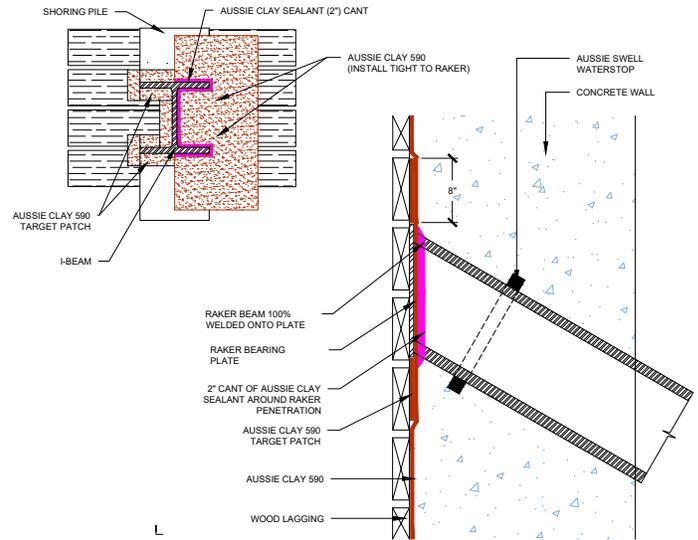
WALL I-BEAM RAKER DETAIL
